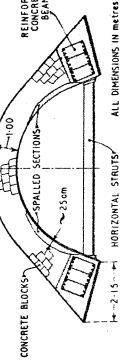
Root-arch failure in a clayey-mylonite section of the new Semmering tunnel. The masonry consists of shaped concrete bricks, and high early-strength cement was used for these and for the reinforced-concrete beams
